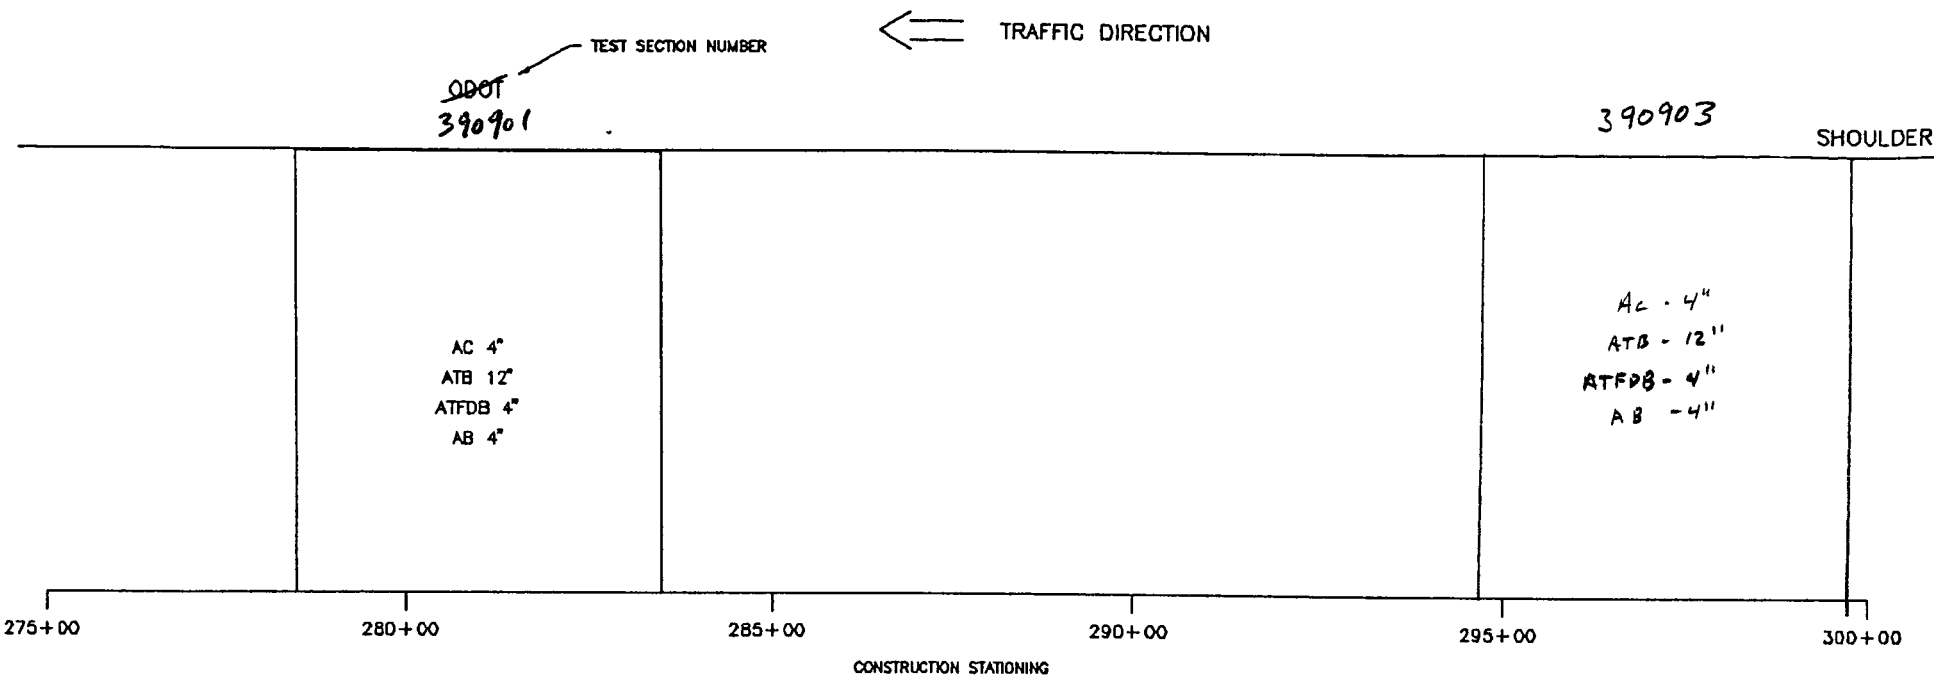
LAYOUT OF TEST SECTIONS - SPS9
